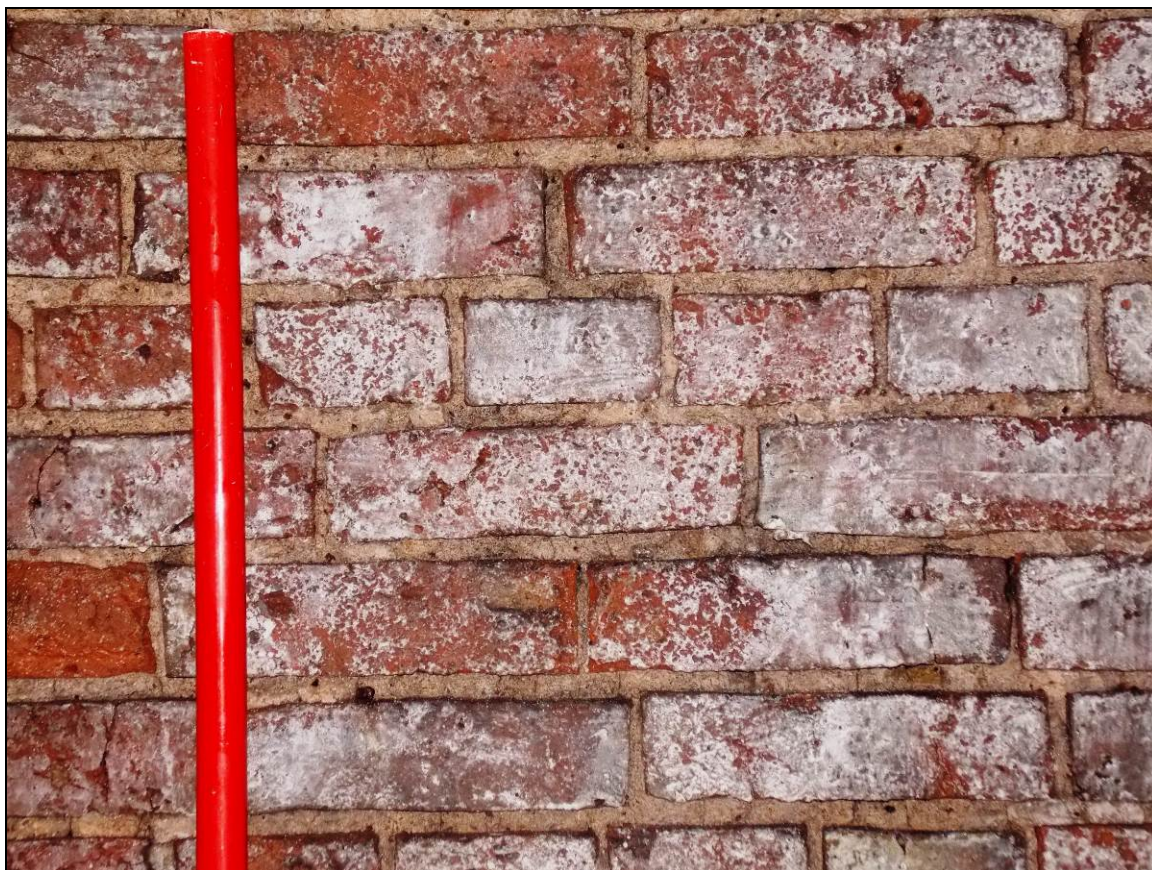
Detail of the primary brickwork of the cross wall dividing the two chambers (scale 500mm).
